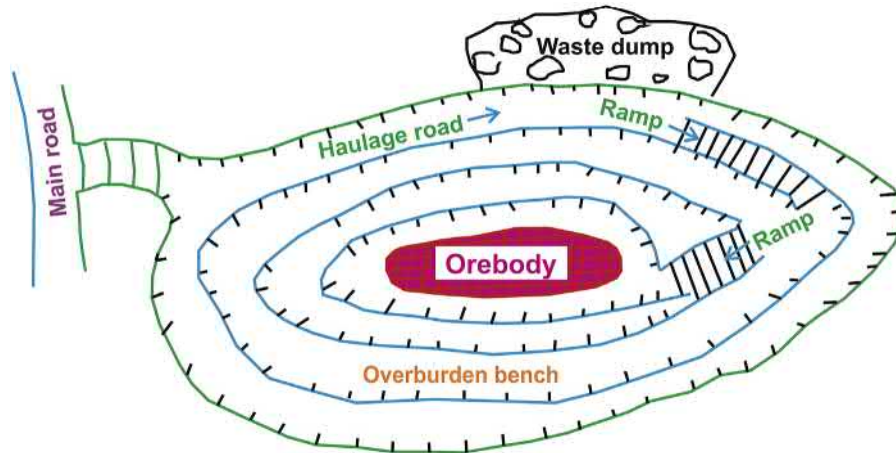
Sketch map to visualize the pit development plan showing the orebody at lower bench, selection of possible waste dump area, haulage road, and ramp.
